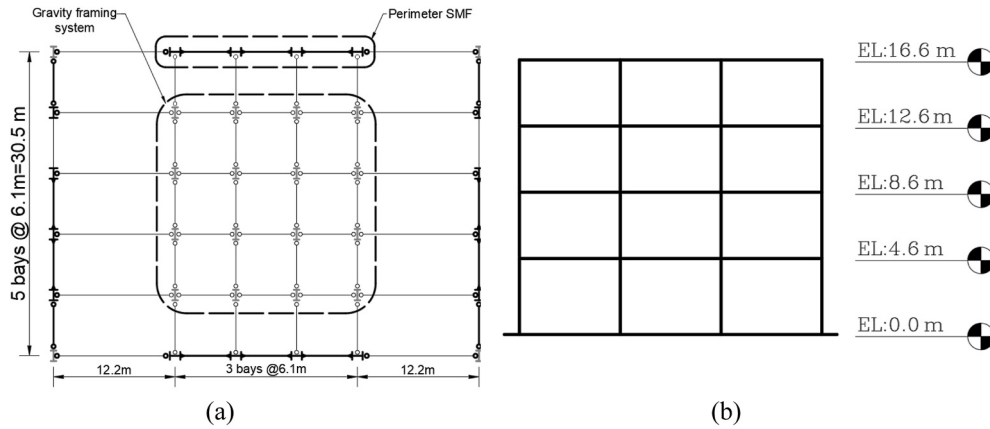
Case-study steel office building: (a) plan view; and (b) elevation view.
